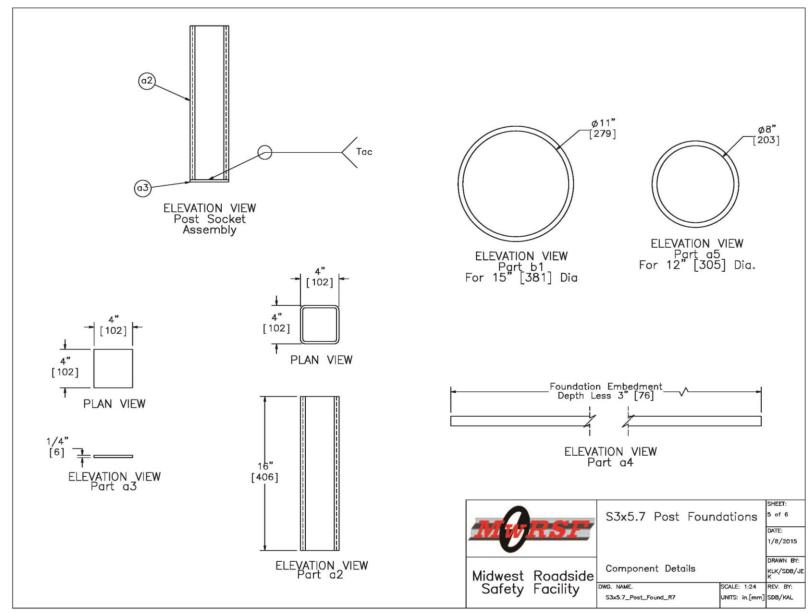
Socketed Foundations for S3x5.7 Posts, Steel Component Details
